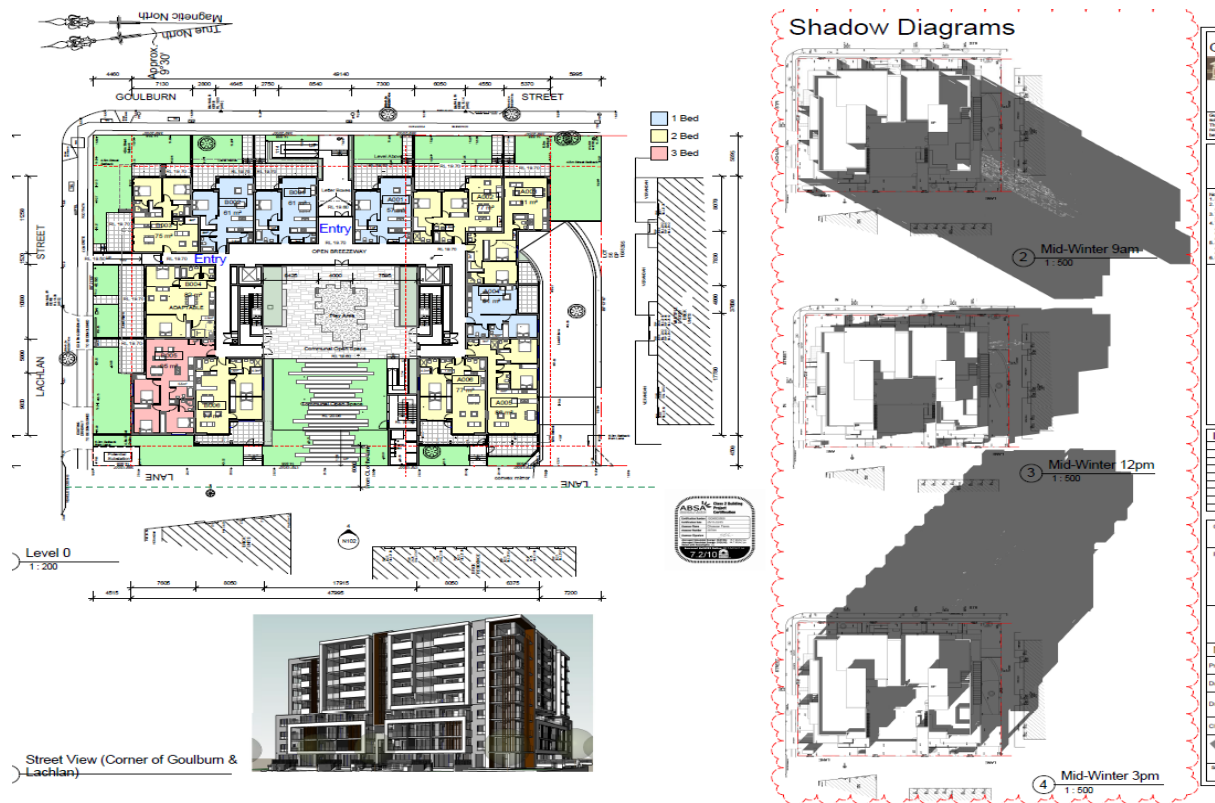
View of shadows cast by the amended proposal at the critical hours of 9am, 12noon and 3pm at mid-winter. The extent of shadows cast upon the southern adjoining sites have been reduced as a result of lowering the south wing of the building from 8-storey to 6-storey.
